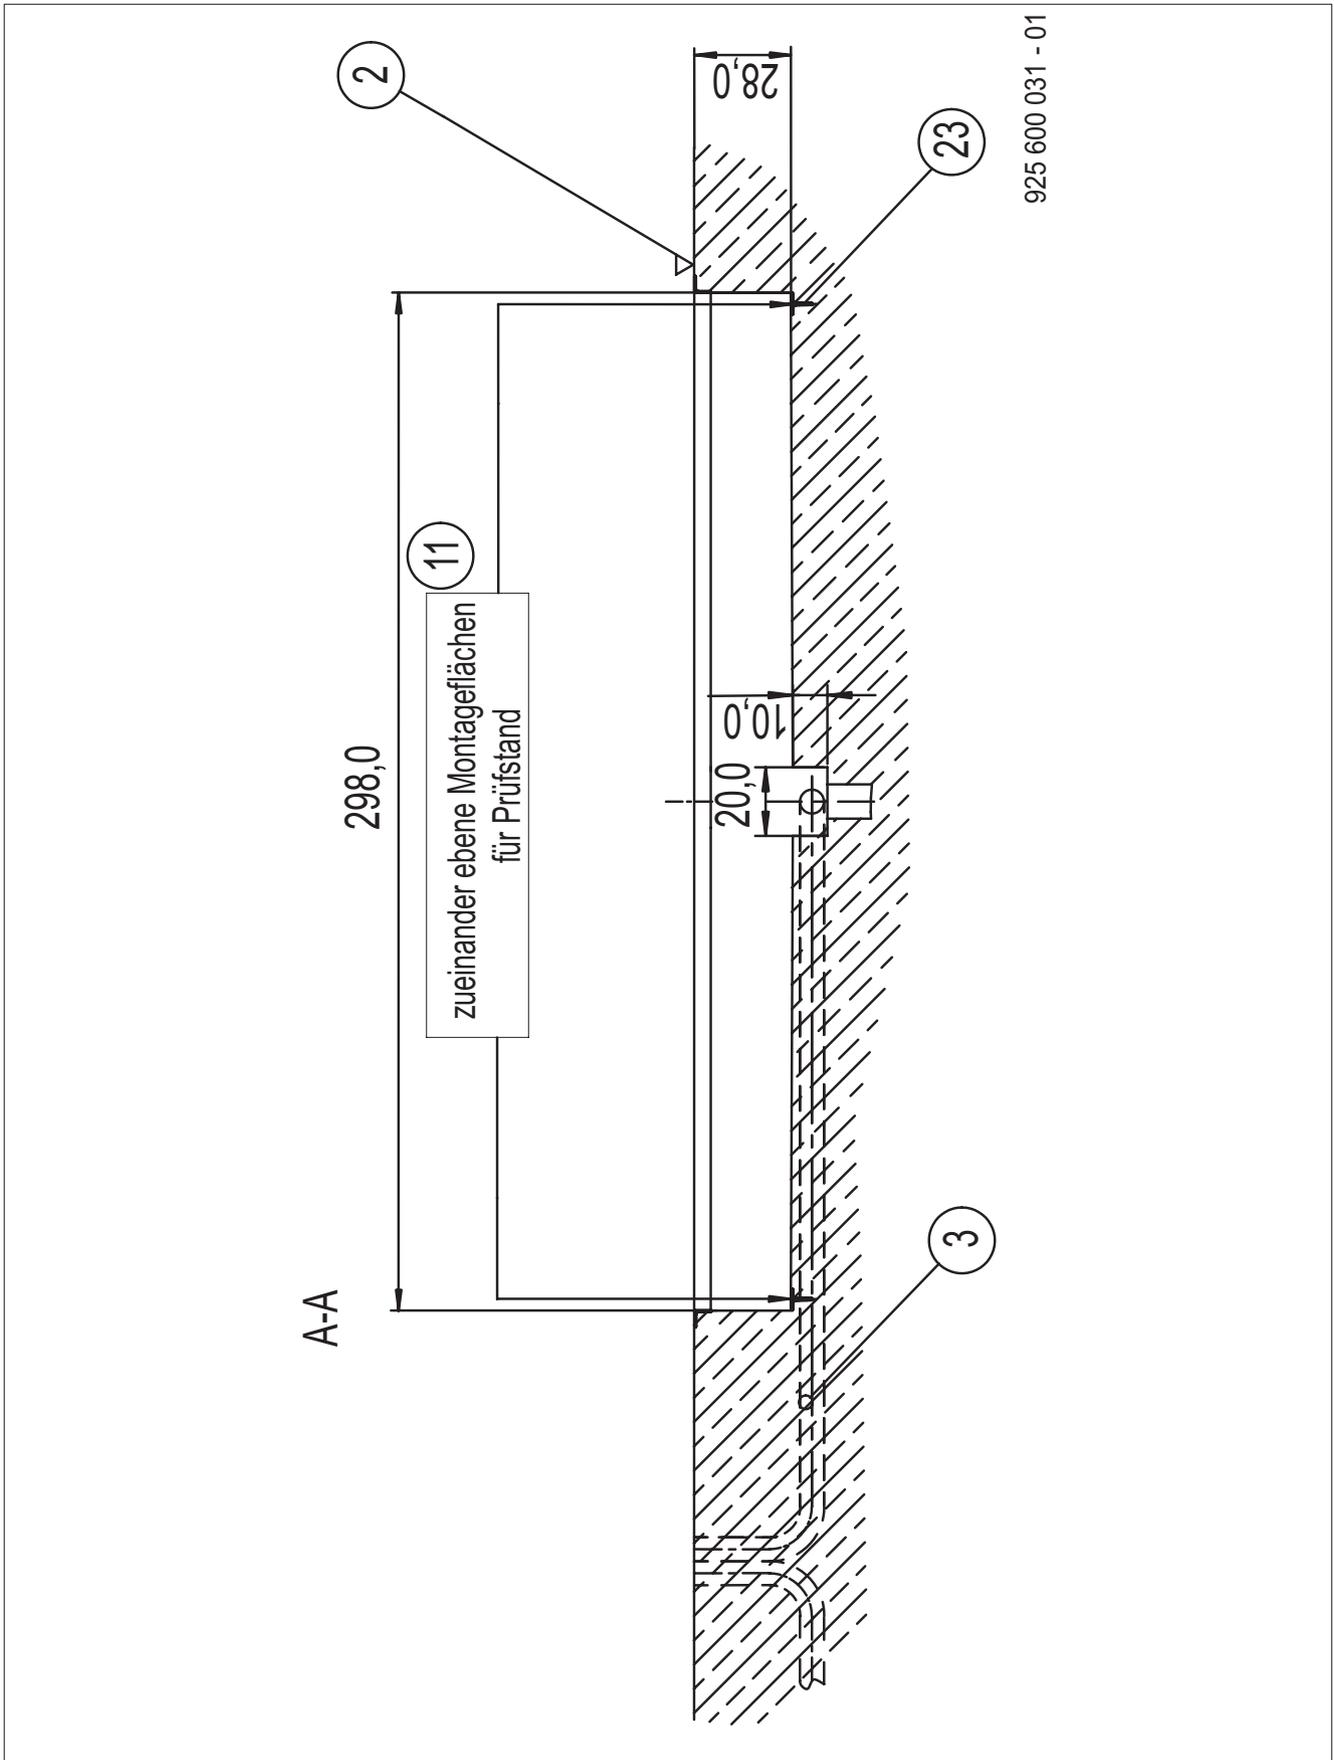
Plan of pit BD 660 with column - Sectional view A-A
